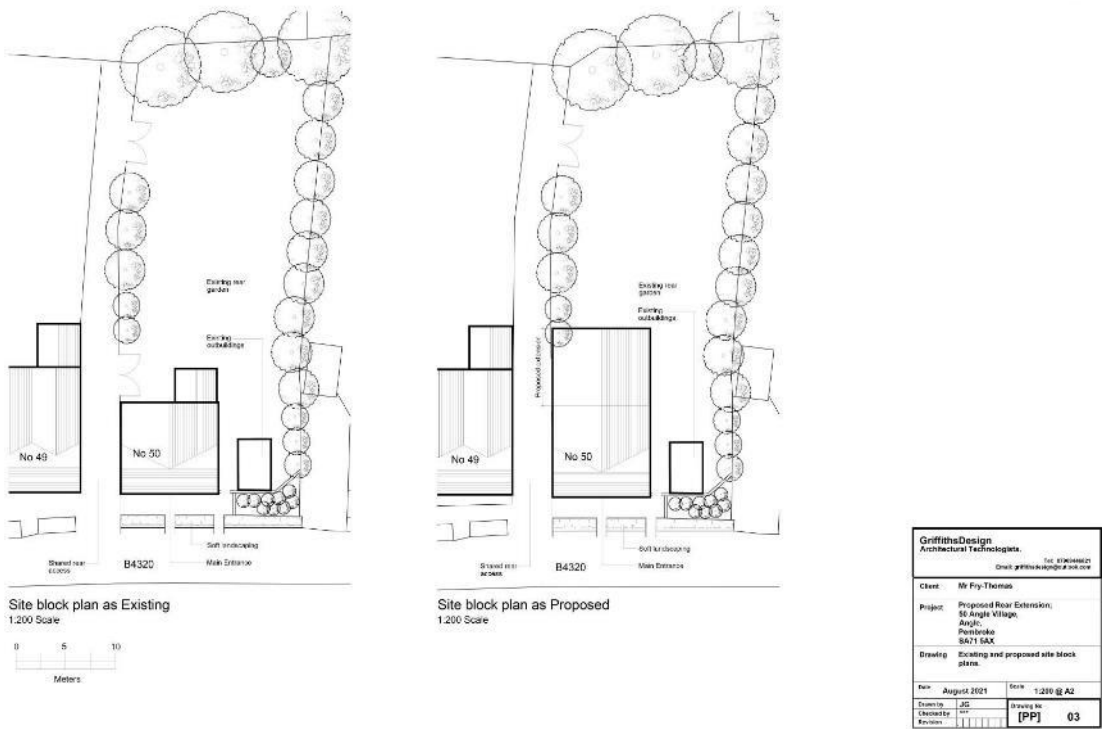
Existing and proposed development plan. Not reproduced to original scale.
